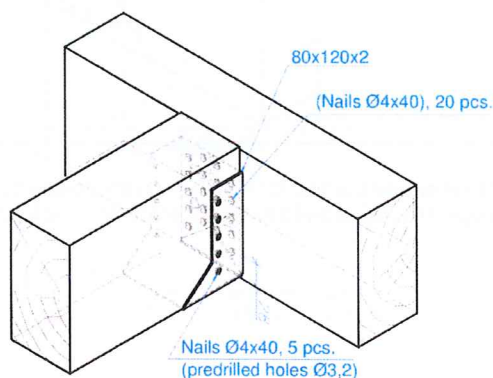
Number and position of nails in the timber beam to timber beam connection with the joist hanger 80×120×2 with interior flanges. Position of nails is symmetrical in both sides.
